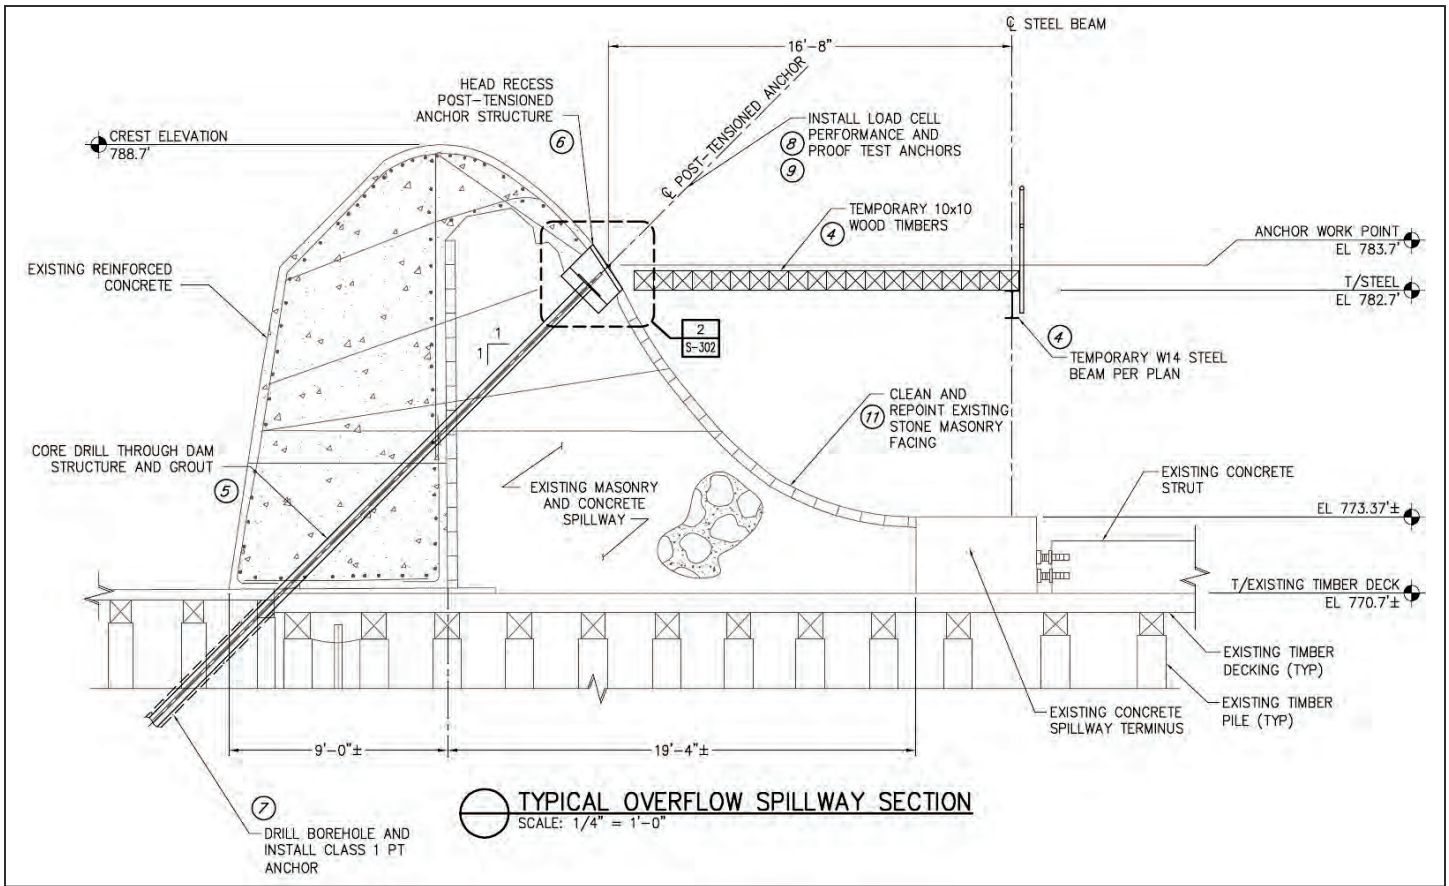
Cross-section diagram of the Otisco Lake dam showing the installation placement of the anchors, the masonry structure and the timber piles CHA
